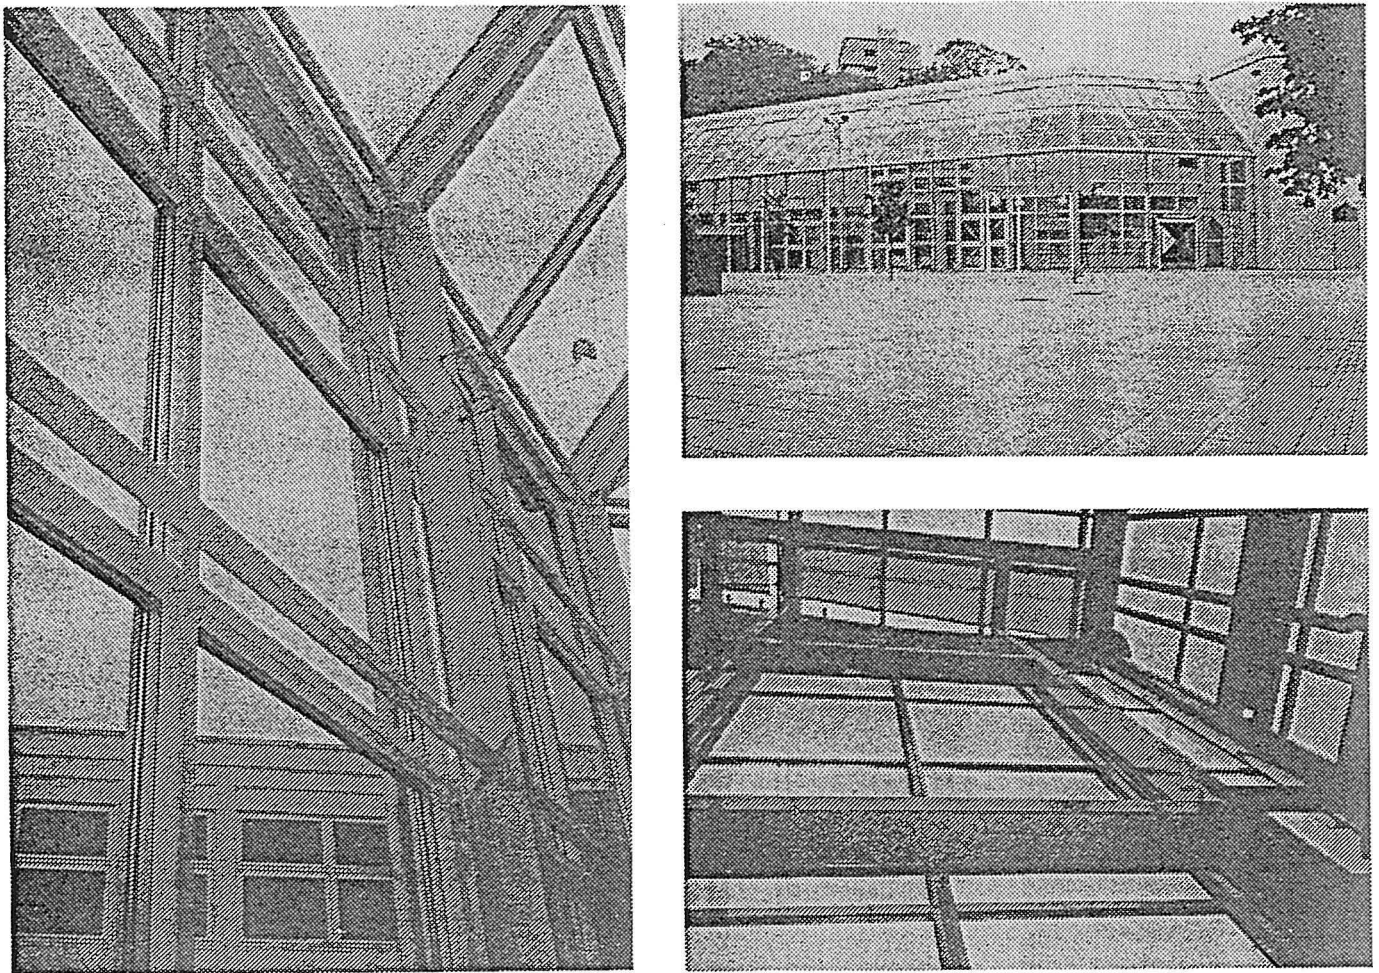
Two examples of the structural system for glazed facades in Denmark.
